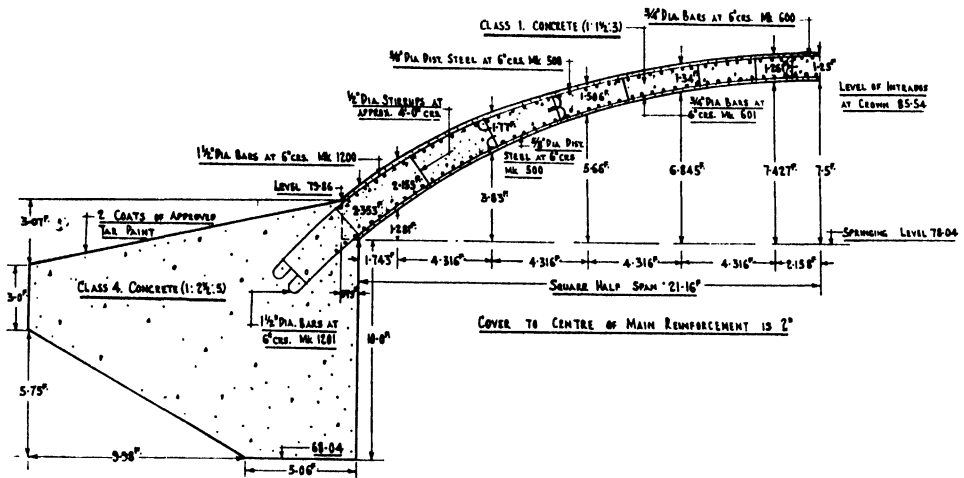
BRIDGEND BRIDGE: SQUARE HALF SECTION OF ARCH RING.
